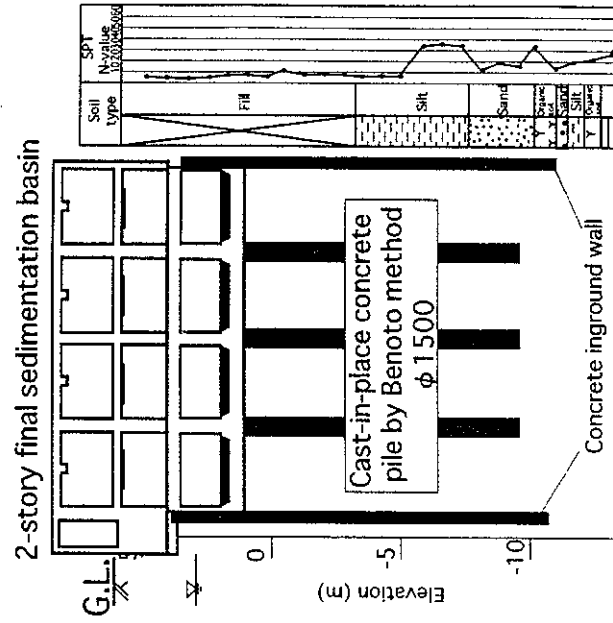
Cross-Section of Basin C at Seibu Sewage Treatment Plant (Hamada and Wakamatsu 1996)
